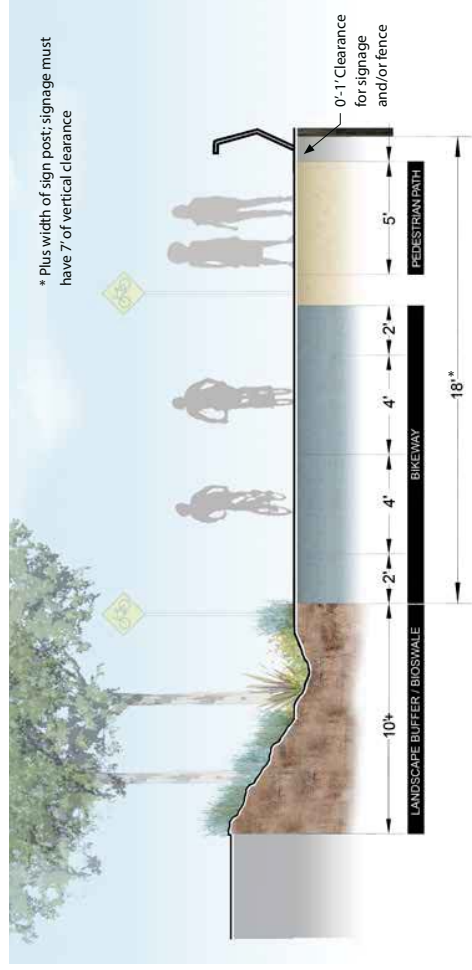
Laurel Canyon Boulevard to Radford Avenue - Typical Cross Section
